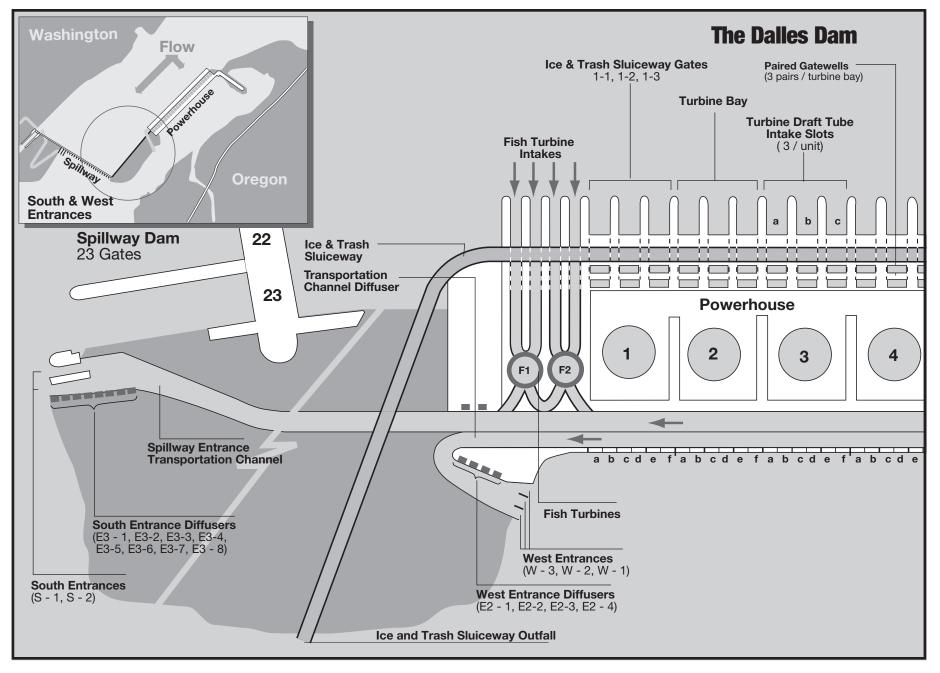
The Dalles Dam South and West Fish Ladder Entrances.
